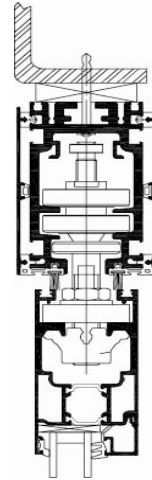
HEAD JAMB with adjustable rod anchorage system and steel "C" channel.
